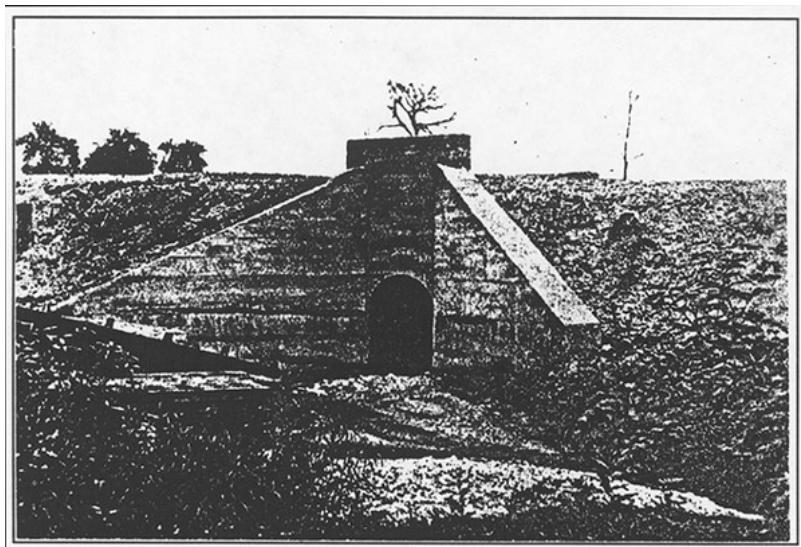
1903 arched concrete culvert (Source: Maryland Geological Survey 1903: Plate XI, Figure 2).
